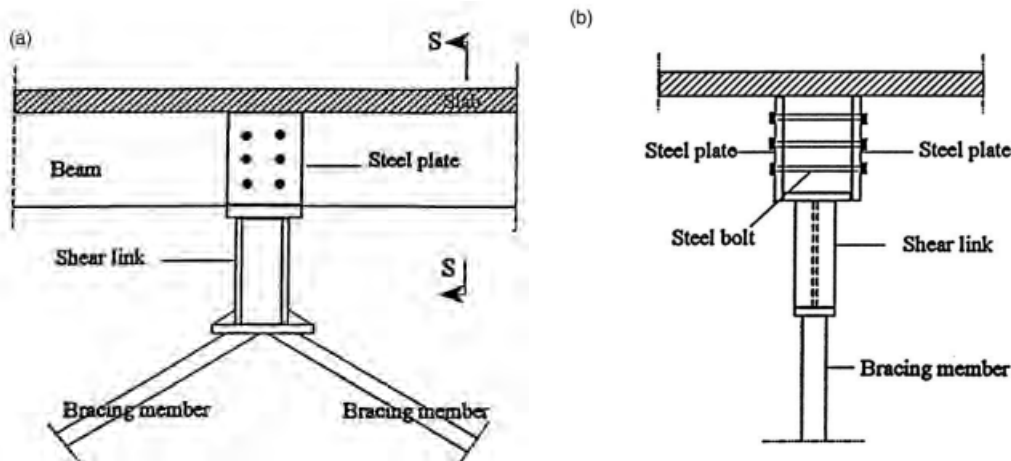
Connection Details of a Vertical Steel Link: (a) Elevation, and (b) Section S-S (Ghobarah et al., 2001)
